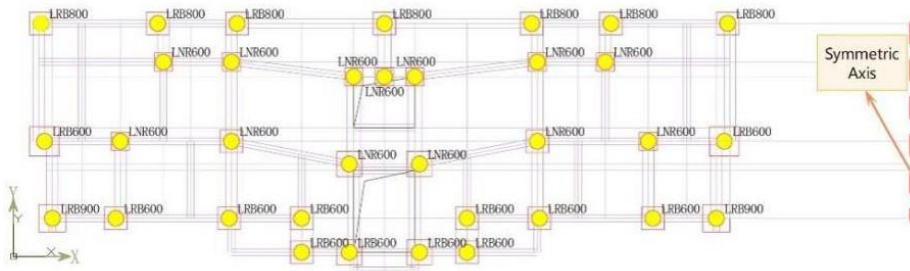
The details of layouts for isolation layer of Model 3 (half plan view)
